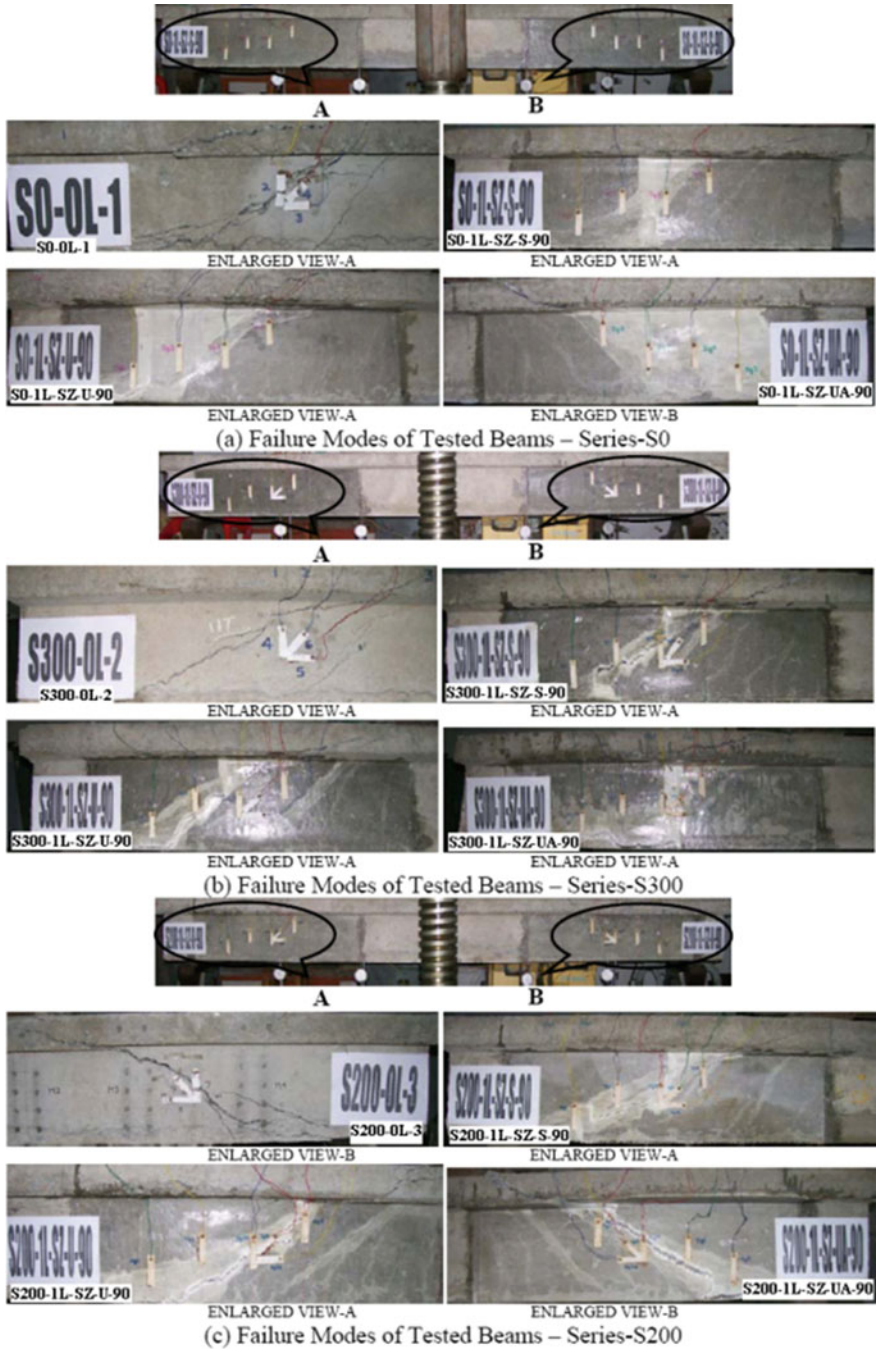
Failure modes of tested beams (GFRP sheet in shear zone)
